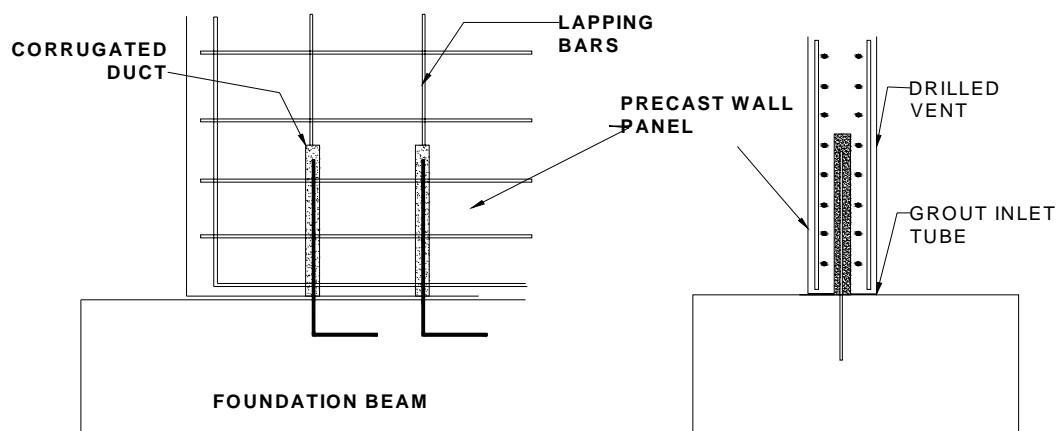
Wall-foundation beam connection through grouted ducting (Restrepo et al.,1996).
